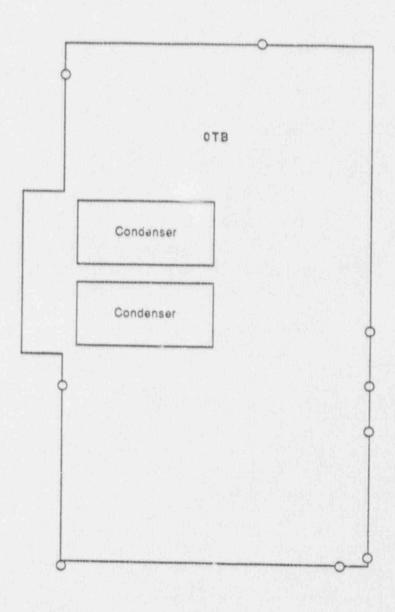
Rancho Seco Turbine Building, Elevation 0 ft. (Sea Level)
